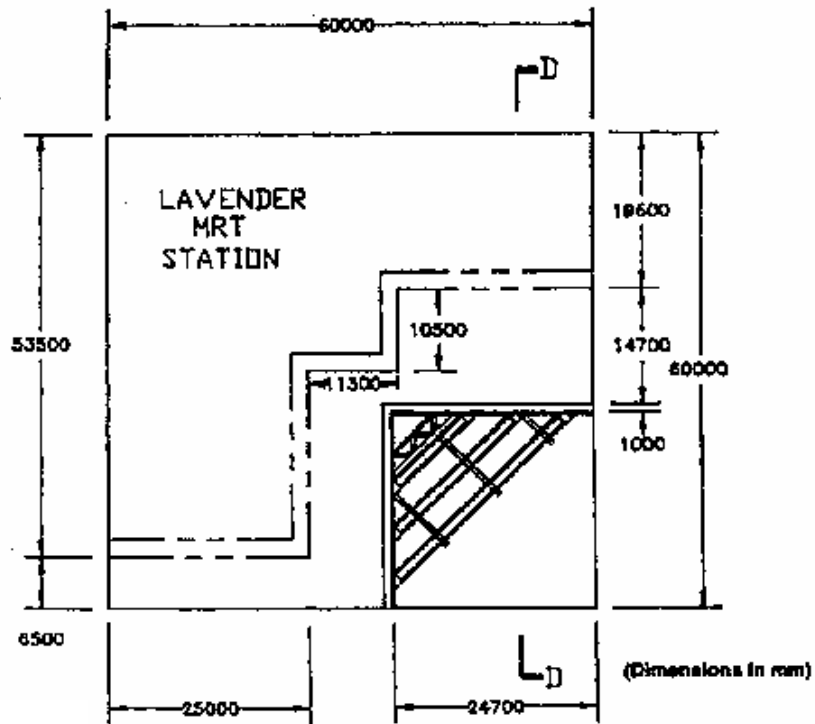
Plan view showing simplified geometry of excavation corner and station used in 3D finite element analysis (by Lee, Yong, Quan and Chee (1998))
